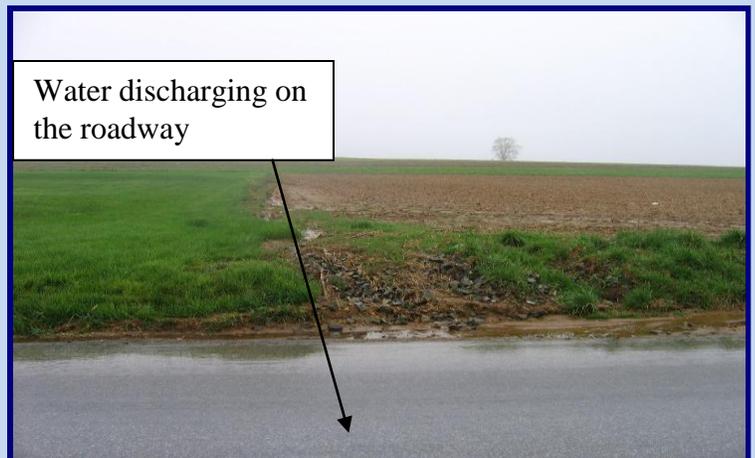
A photo of storm water that is not adequately retained and overflow water runs off onto the roadway surface
